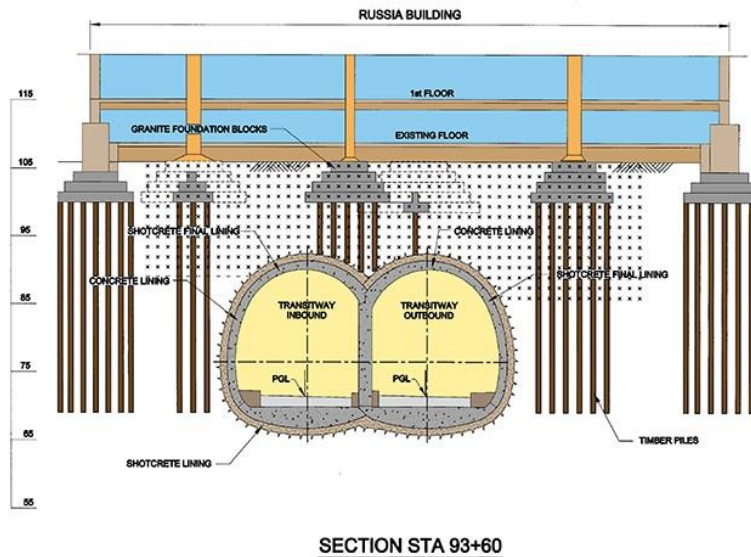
Cross section of the tunnels underneath the Russia Wharf
